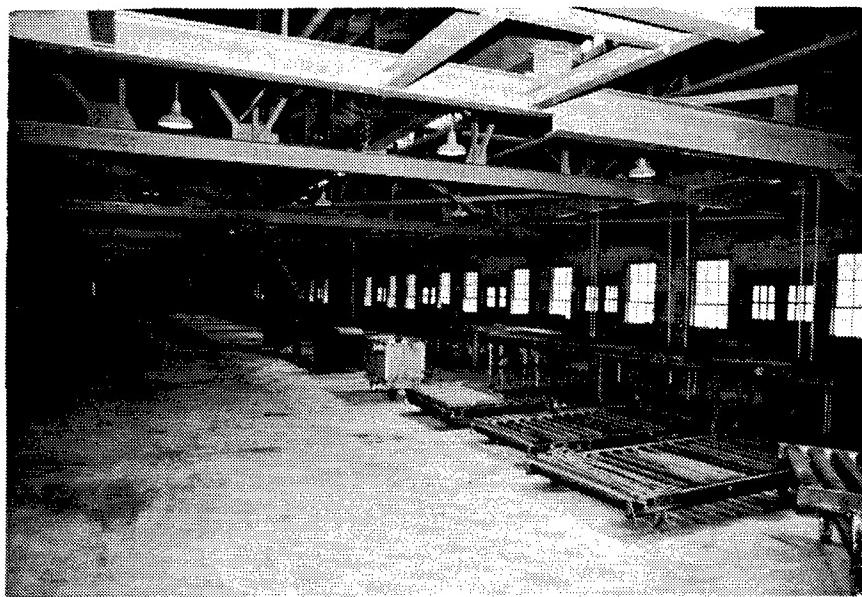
Building CB-3: Interior view of a Receiving and Painting Building.
